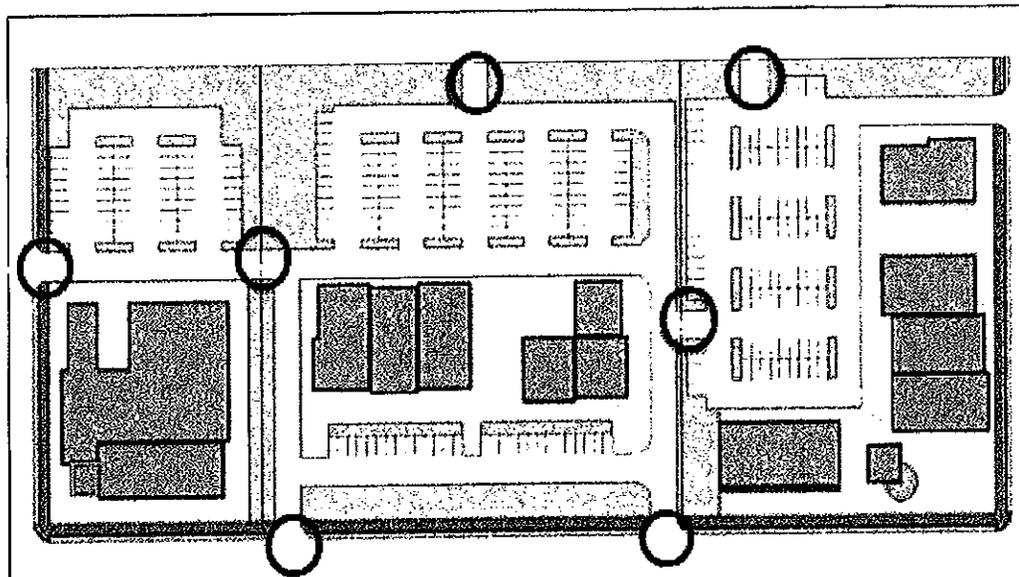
Cross-access between parking areas and adjoining developments. Joint access through the utilization of common driveways between developments.
